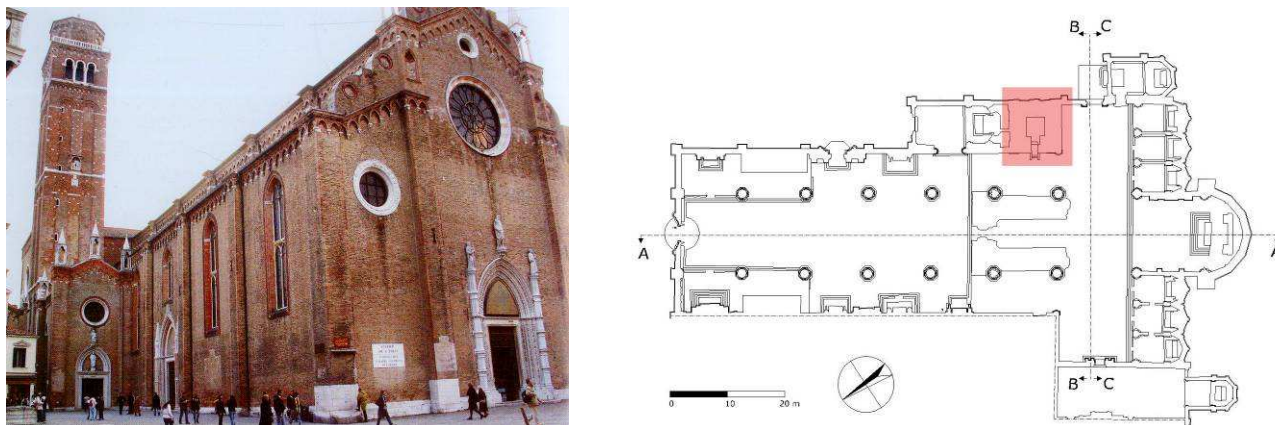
“Santa Maria Gloriosa dei Frari” basilica and bell-tower. Plan view of the church
